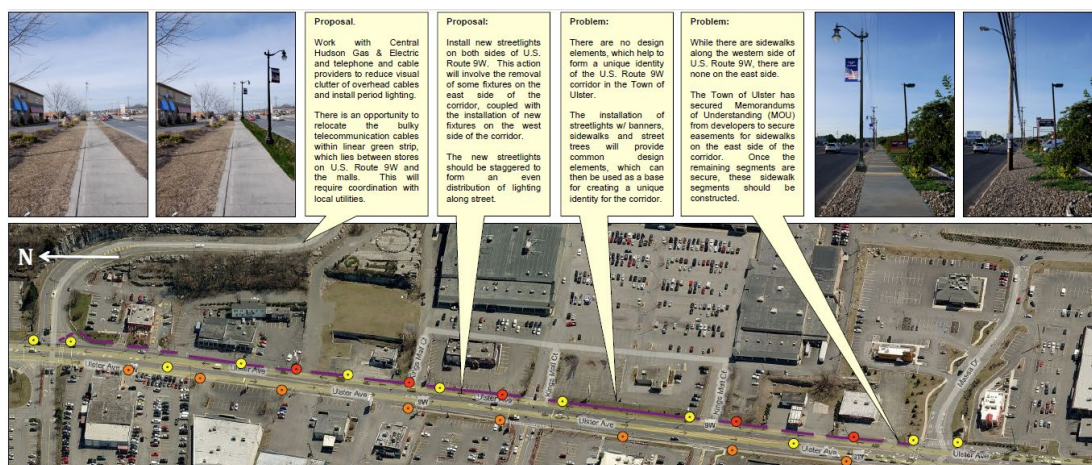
Proposed Sidewalk Improvements from Route 9W Corridor Enhancement Plan (2014)
